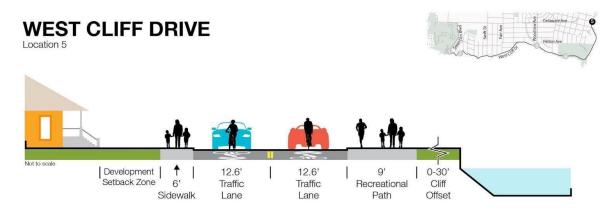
Alternative 1 Enhancements at Cross Section of Santa Cruz St and West Cliff Drive
